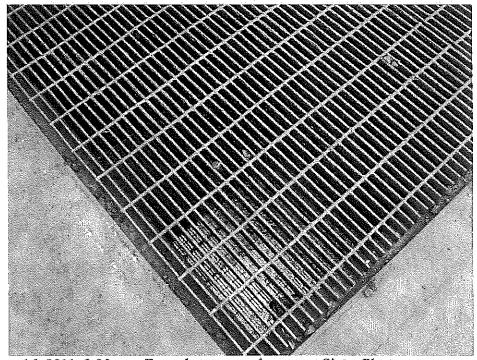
June 16, 2011, 9:30 a.m. Fenced storage pad sump, at Sinter Plant.
